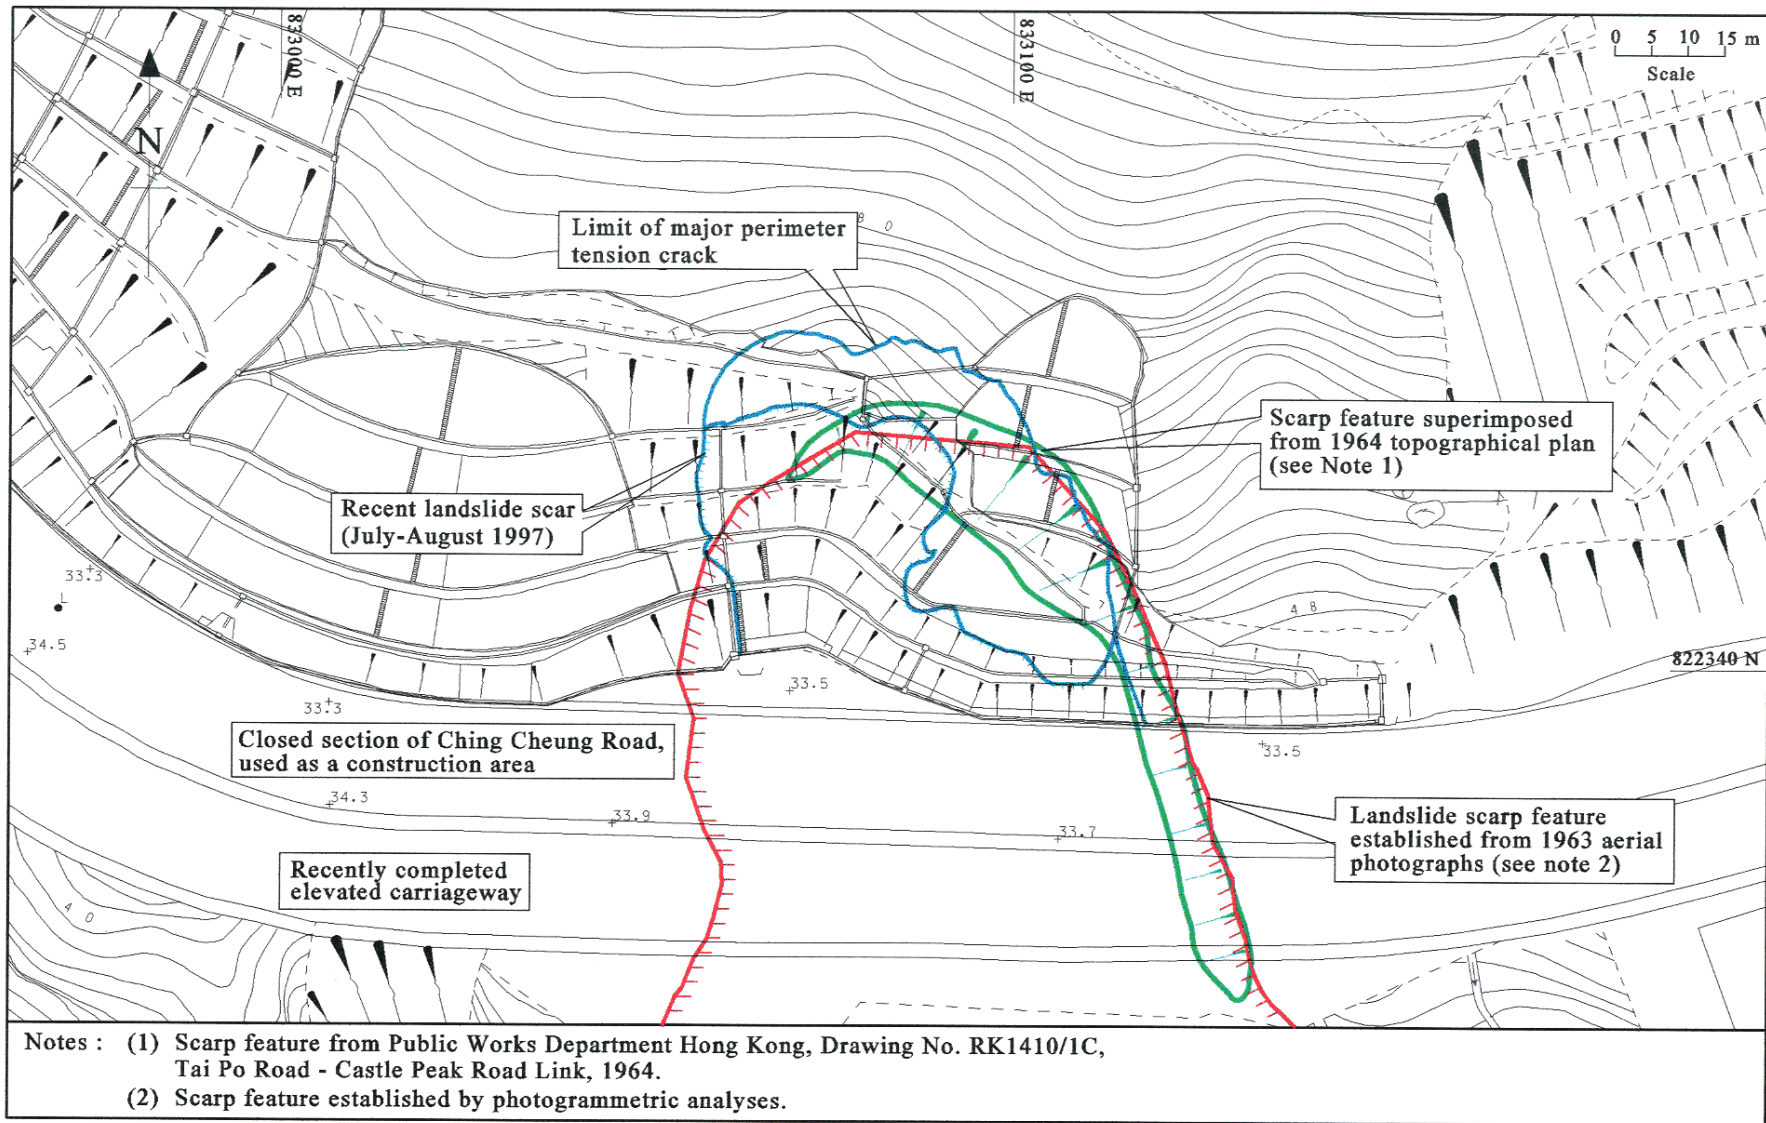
Plan Showing 1954/63 Failure Scarp Superimposed on Recent Failure
